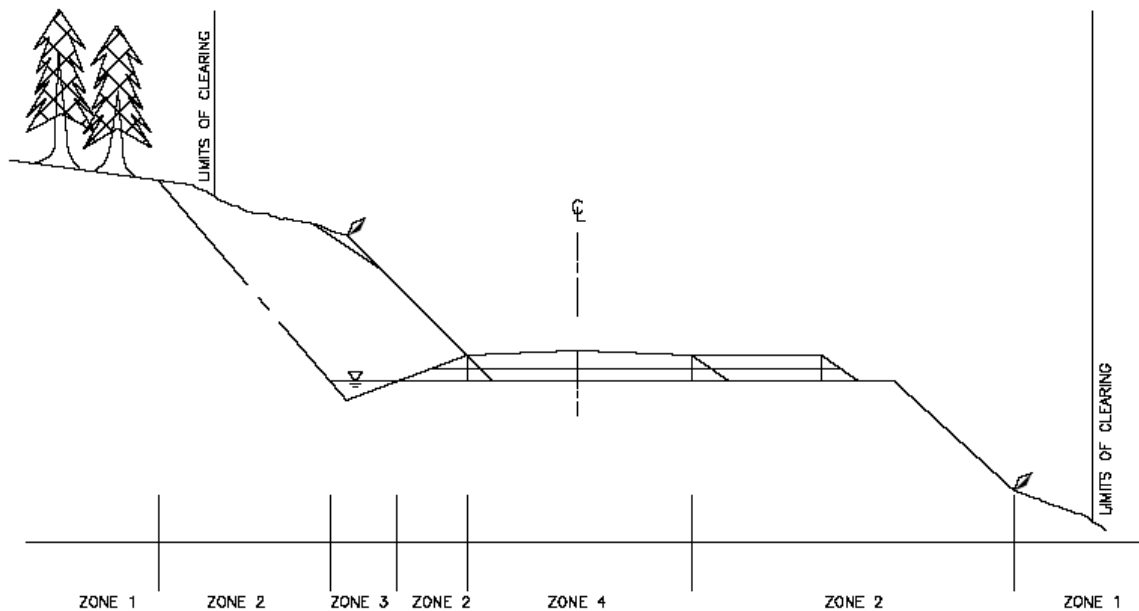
Roadway BMP and LID Zones for Bench Sections.
